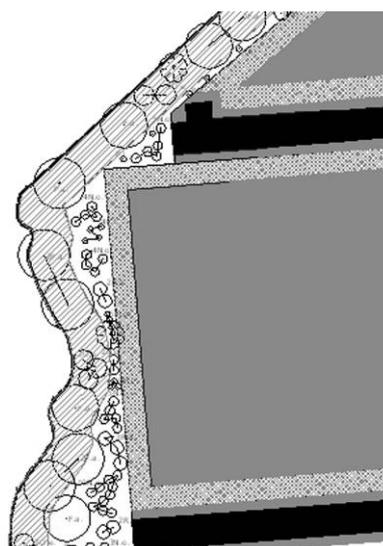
Detail of the plantation and ground cover plan of the study area (Autocad 2007 software).
